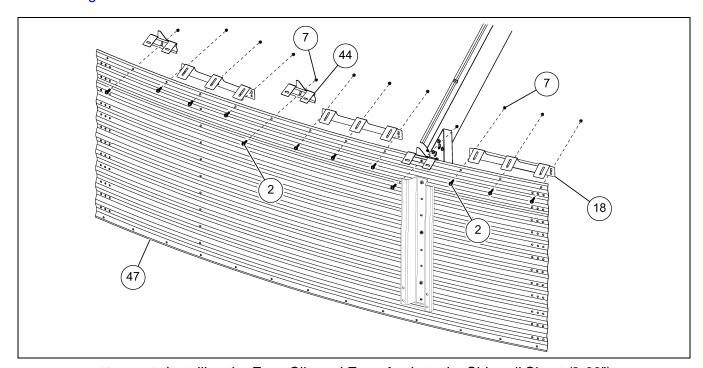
D Installing the Eave Clip and Eave Angle to the Sidewall Sheet (2.66")
